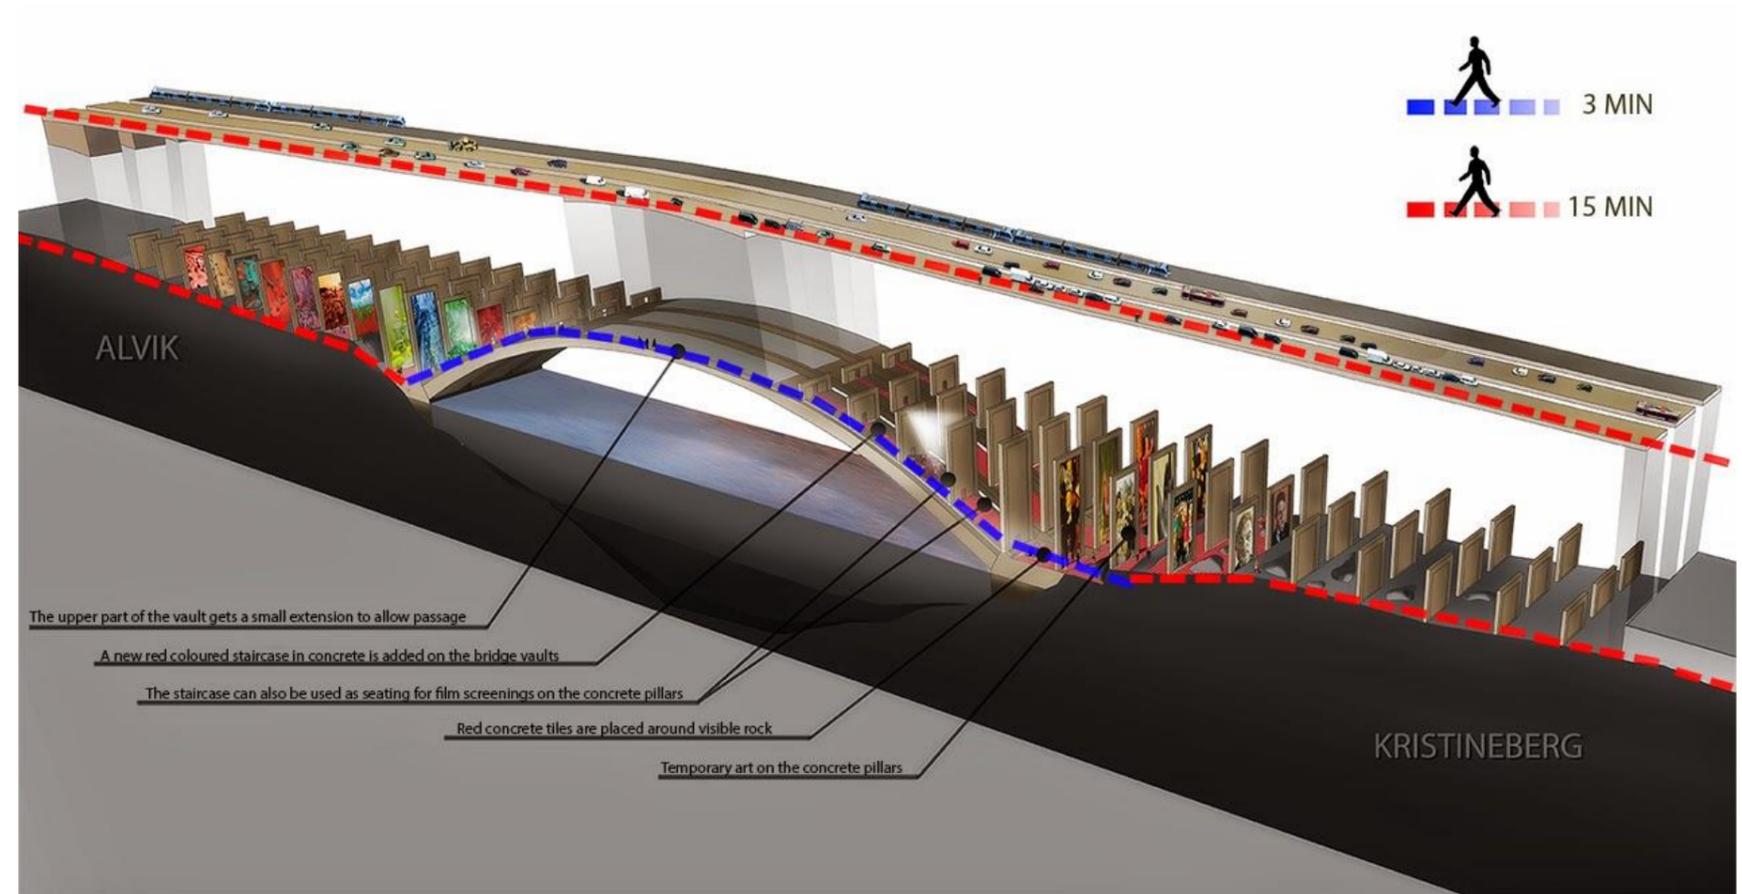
Improved pedestrian passage. Under the Bridge. (Berensson, 2014)
